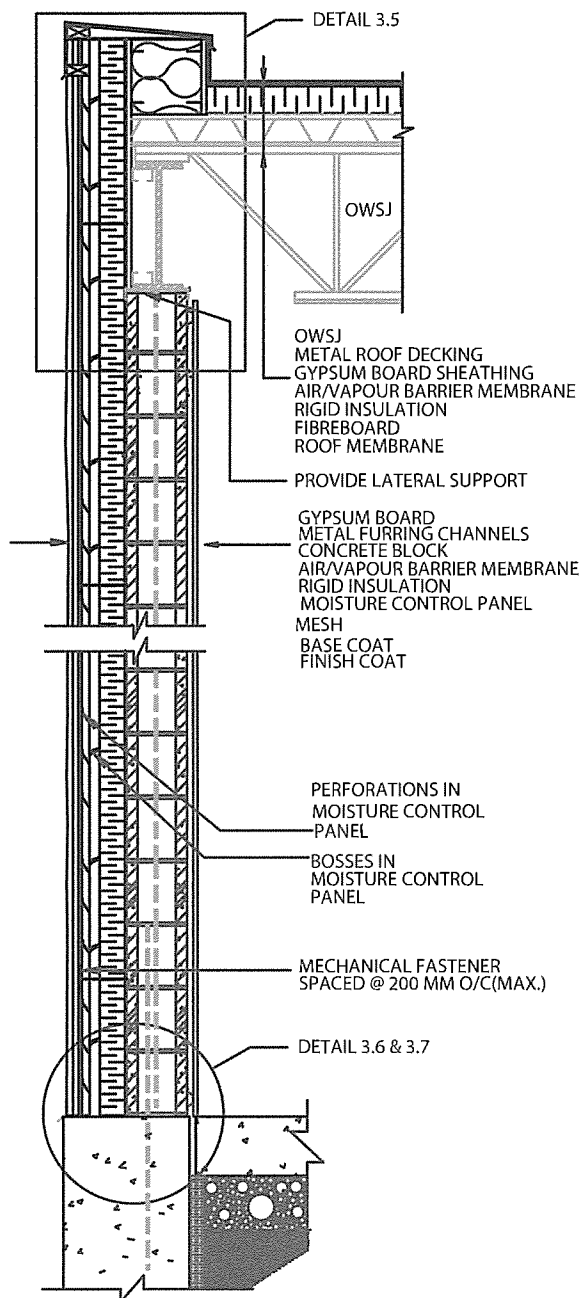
ACRYLIC STUCCO / CONCRETE BLOCK WALL
